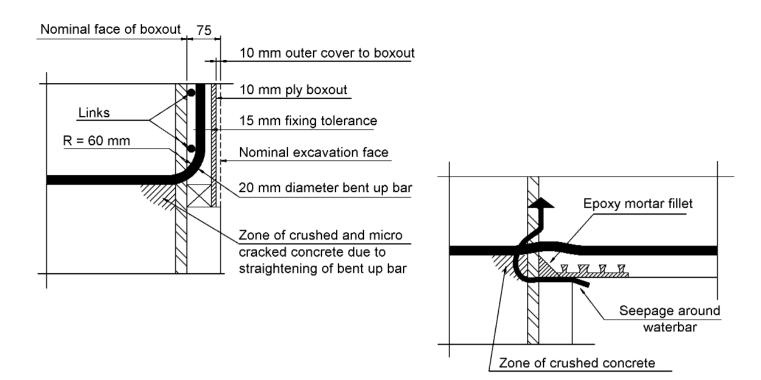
Typical detail of bent out bars in diaphragm wall panel
